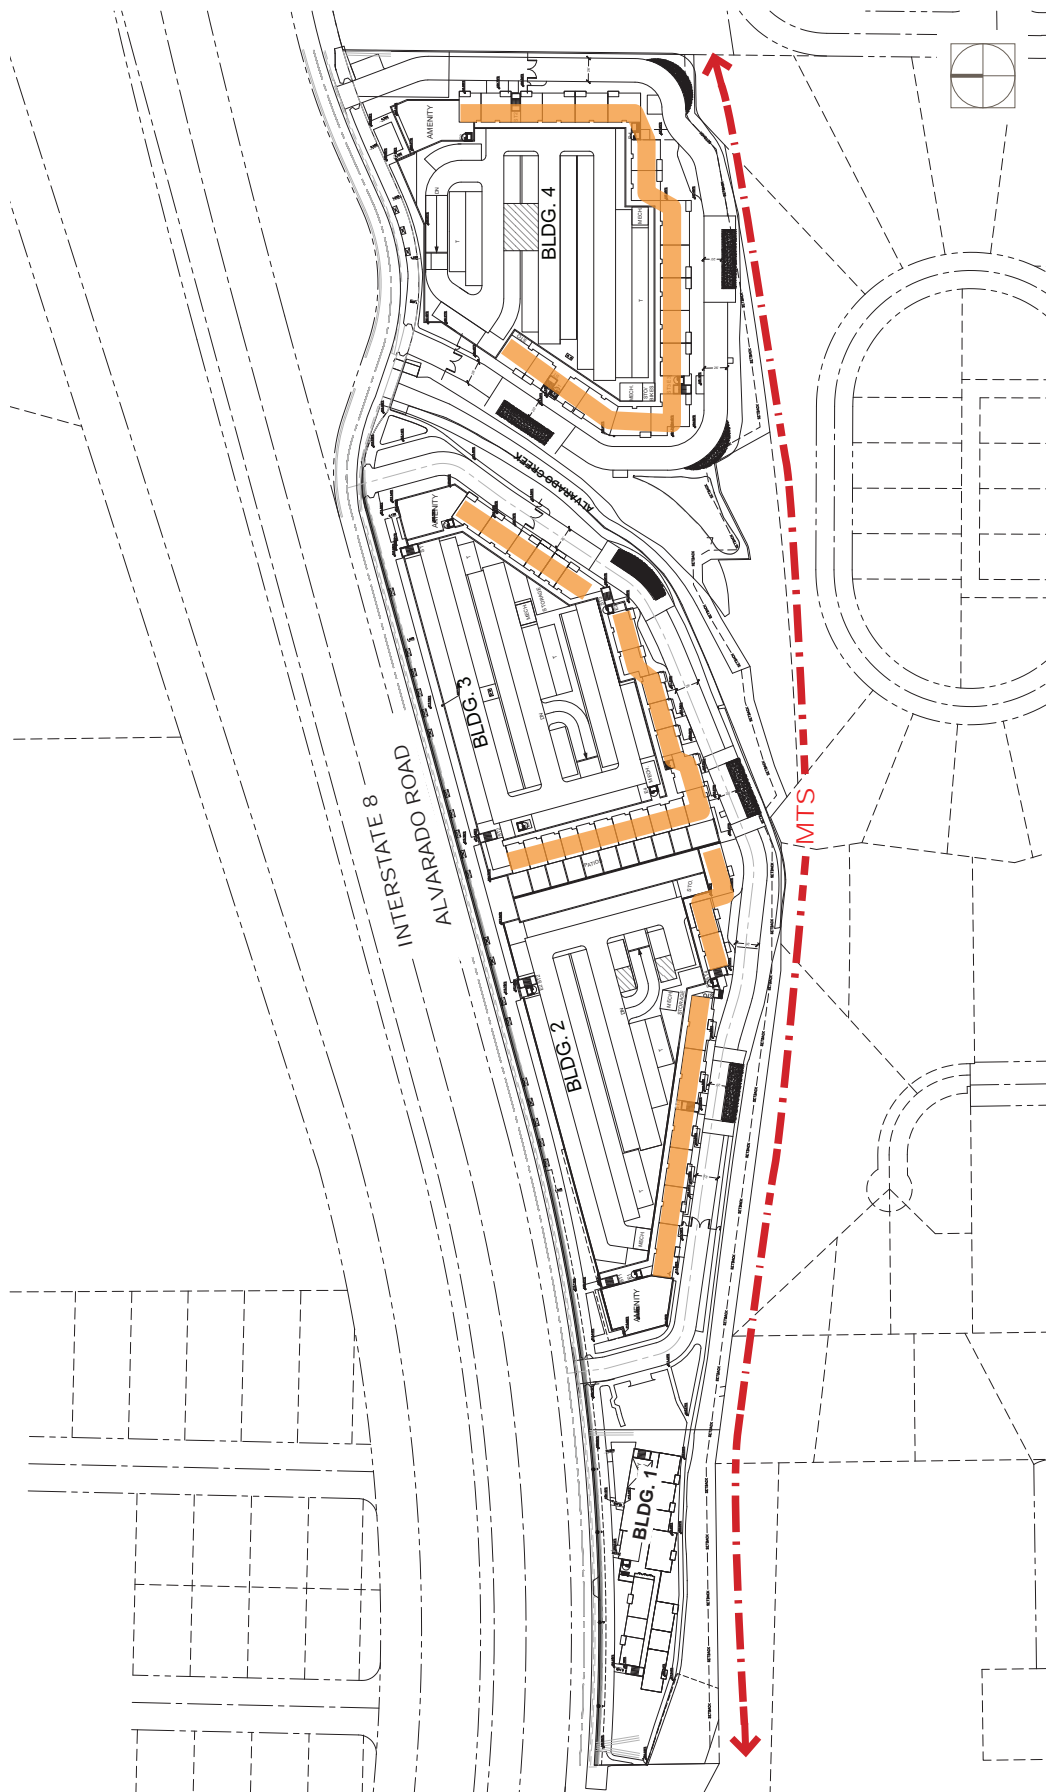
Form-Based Development Standards Typical Building Plan View at Third Floor
